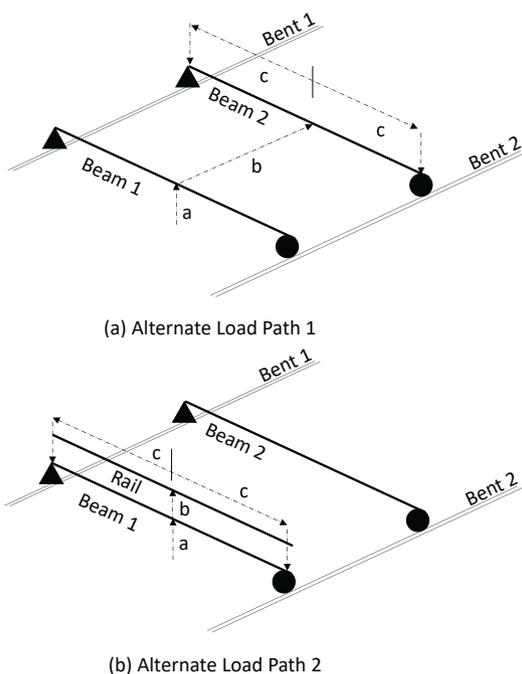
As a result of redundancies, two alternative load paths are available after a fascia girder, represented in the figure as beam 1, is heavily damaged near midspan. Figure: Dr. Oguzhan Bayrak.
